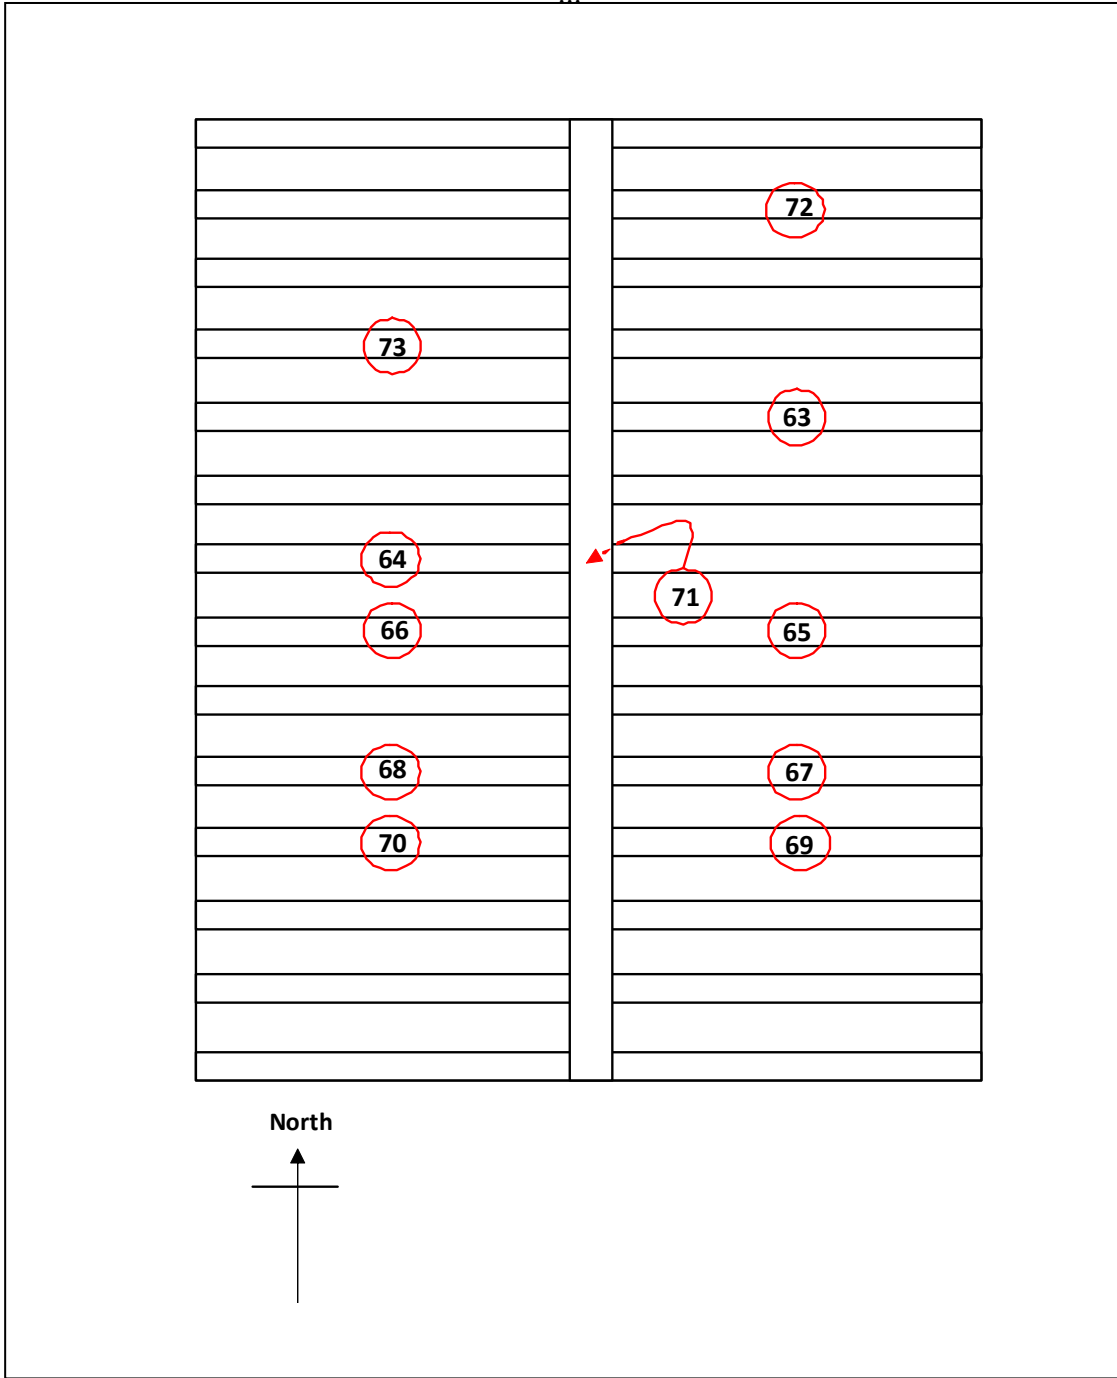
Plan of the 'Bakehouse' roof to show sampled timbers
